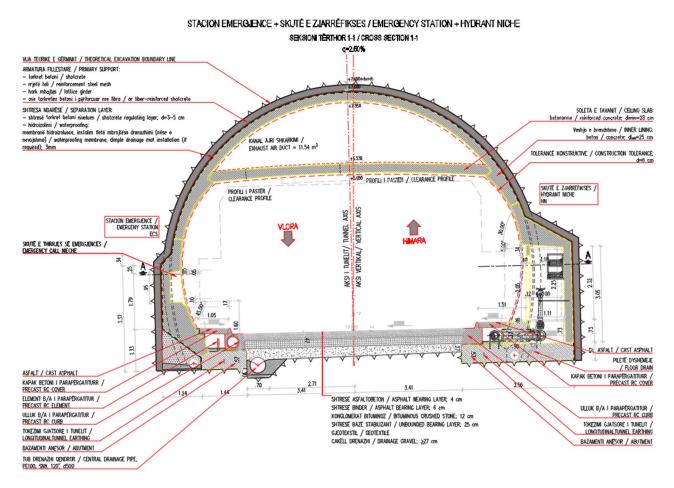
Cross section of the main tunnel at emergency station and hydrant niche
